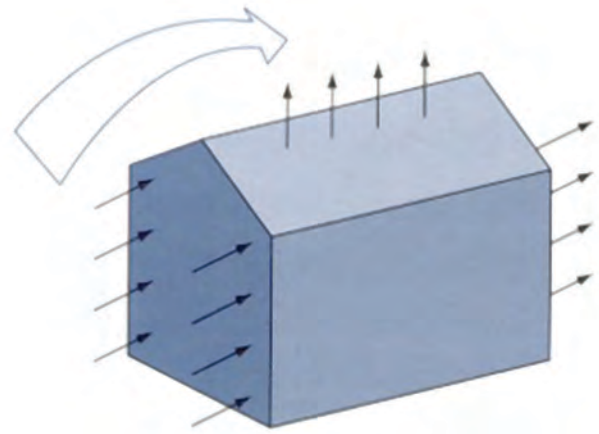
Fully enclosed building (preserving the envelope). (Saflex, 2006)
